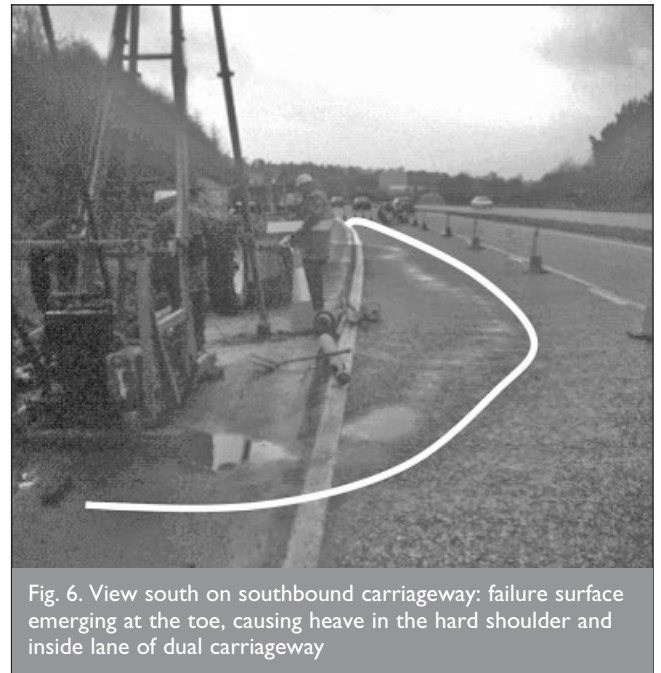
View south on southbound carriageway: failure surface emerging at the toe, causing heave in the hard shoulder and inside lane of dual carriageway
